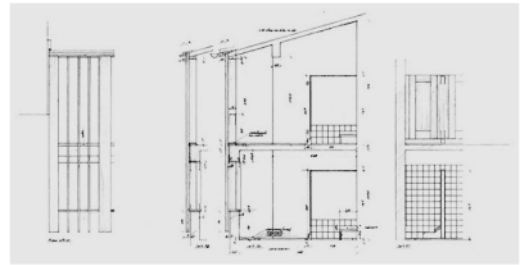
Quinta da Conceição Swimming Pool, A. Siza, cross sections 1961 (Arquivo da Fundação Serralves).
